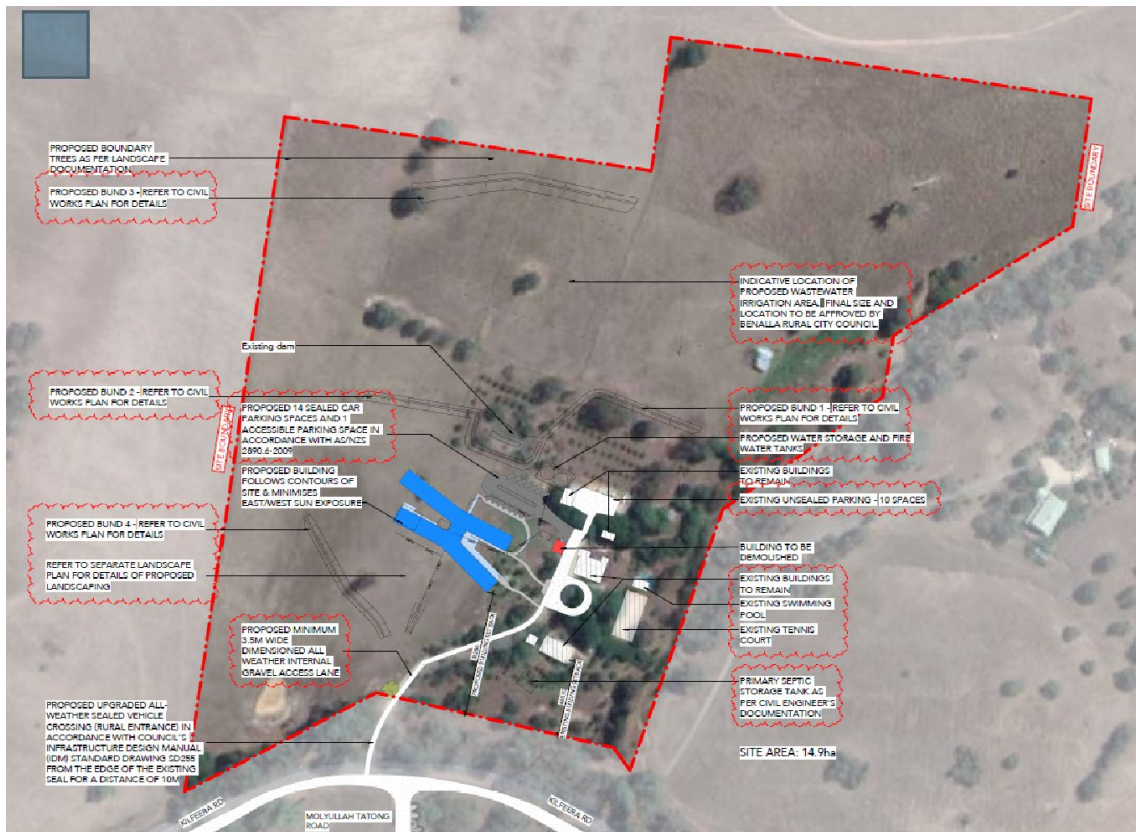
Location of the proposed buildings (shown in blue) and works on the subject land
